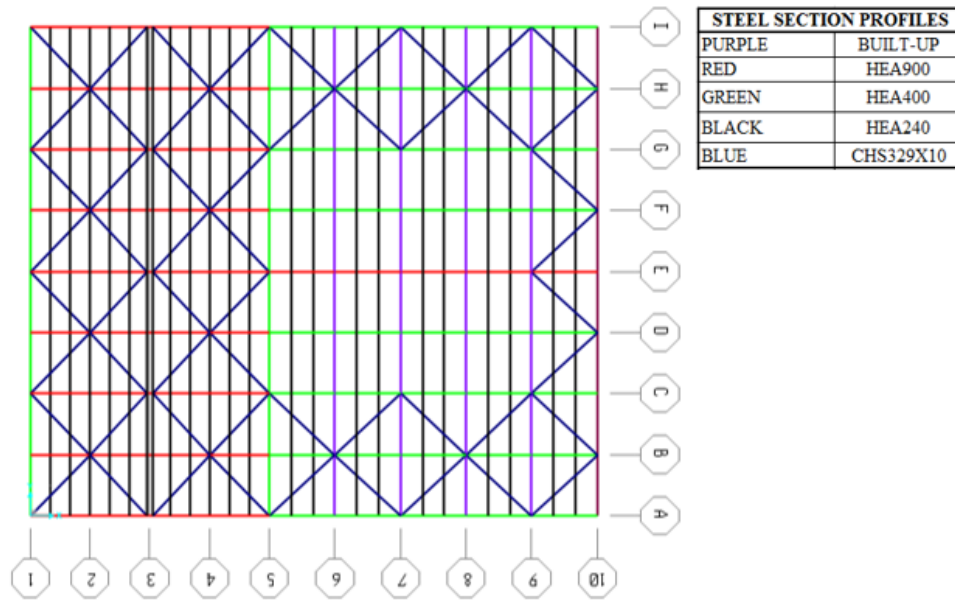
General Layout and Steel Sections at Roof of the Building.
